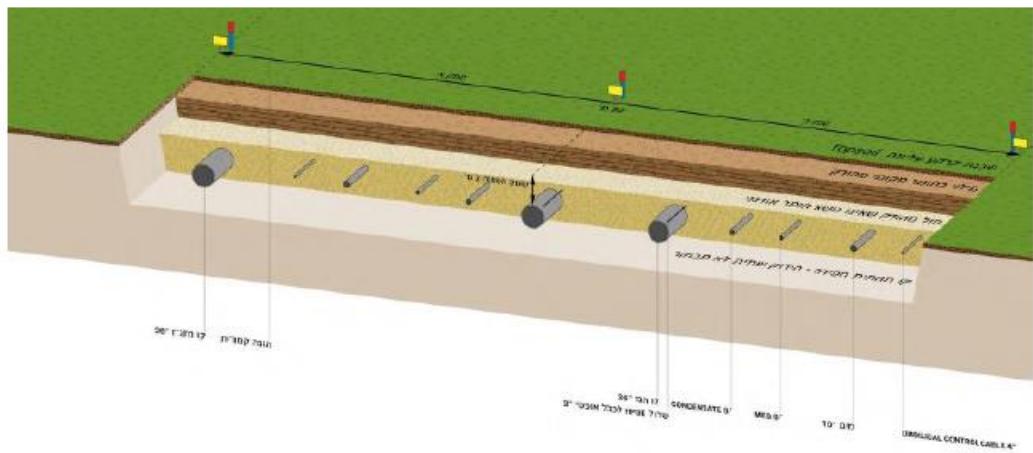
Typical Sections for Laying the Pipeline
